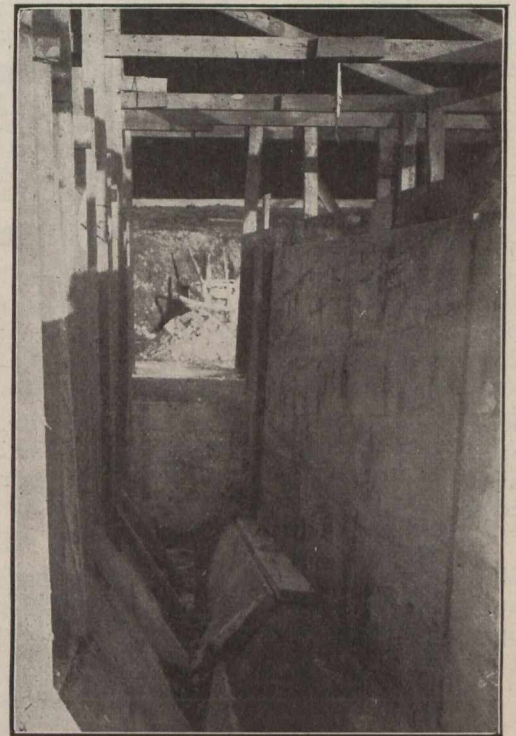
Showing Formwork and Drains; One Grit Chamber Under Construction.
